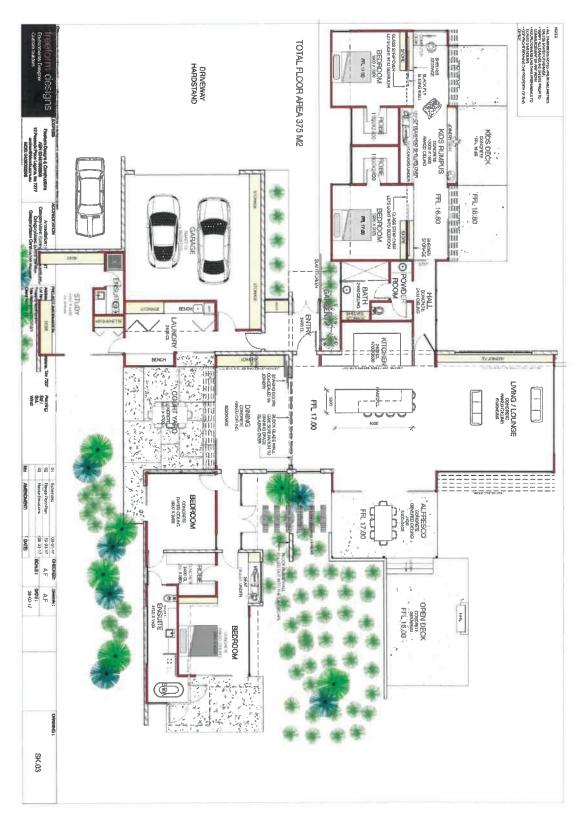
; plans of the proposed residential dwelling (source Freeform designs)
